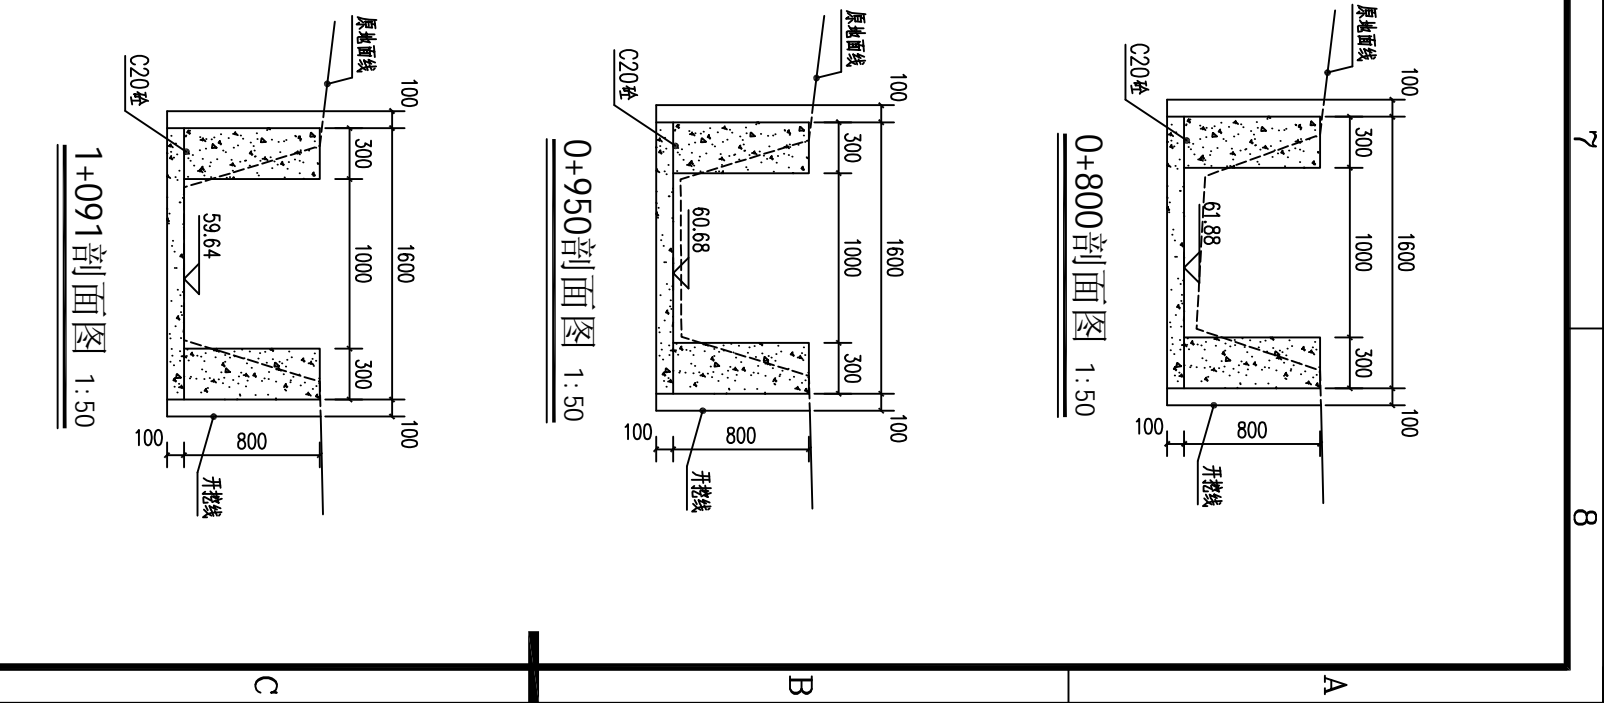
shows three cross-sections of a foundation structure, labeled A, B, and C, illustrating the original ground level (原地面线) and the proposed foundation level (开挖线).
